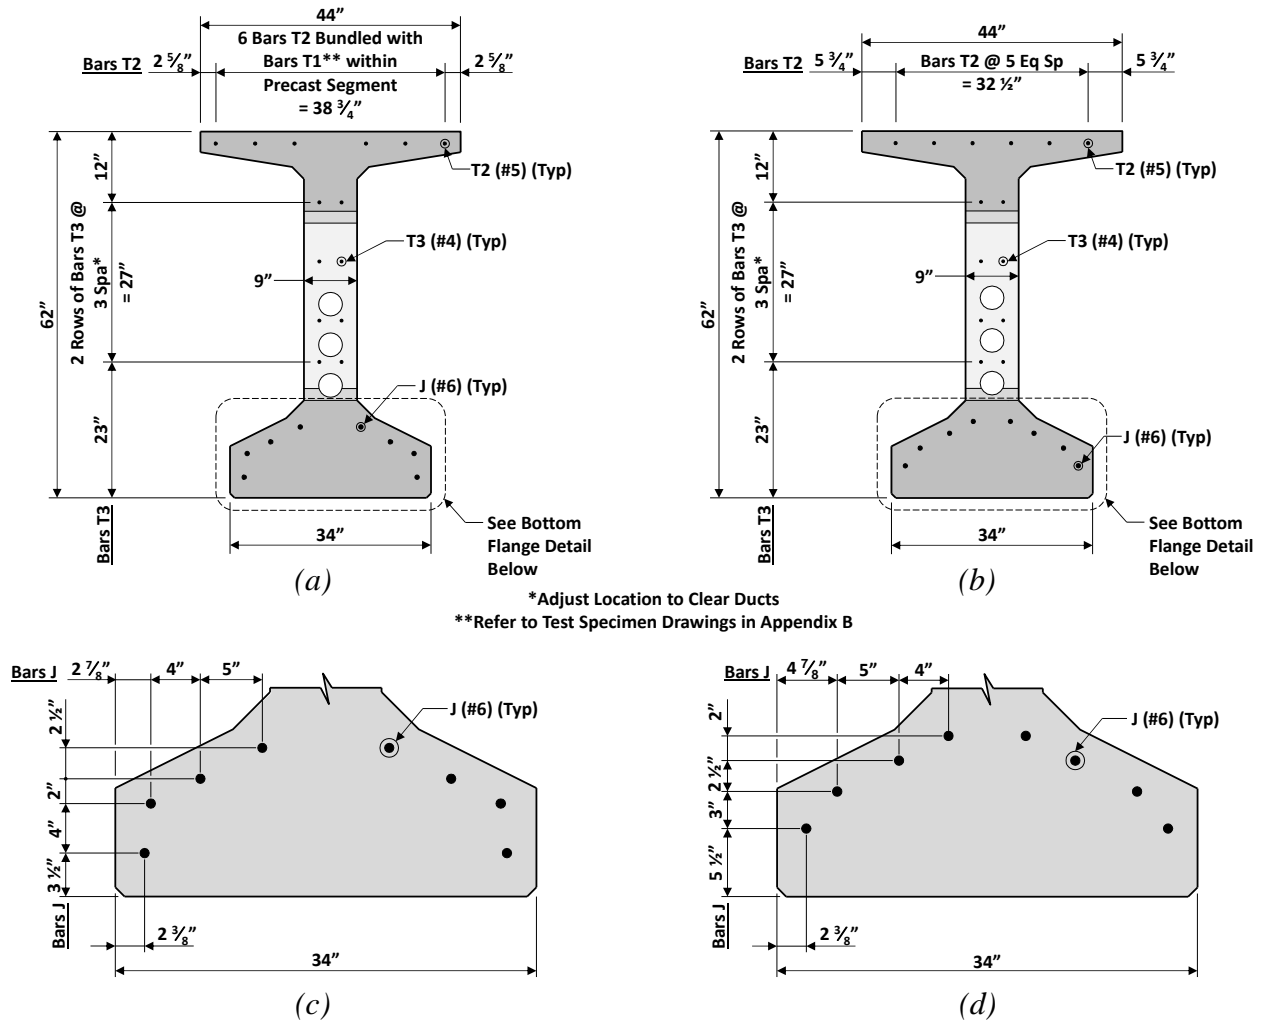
Longitudinal interface reinforcement of Test Girder 2– (a) end of long precast segment; (b) end of short precast segment; (c) flange detail of long precast segment; (d) flange detail of short precast segment
